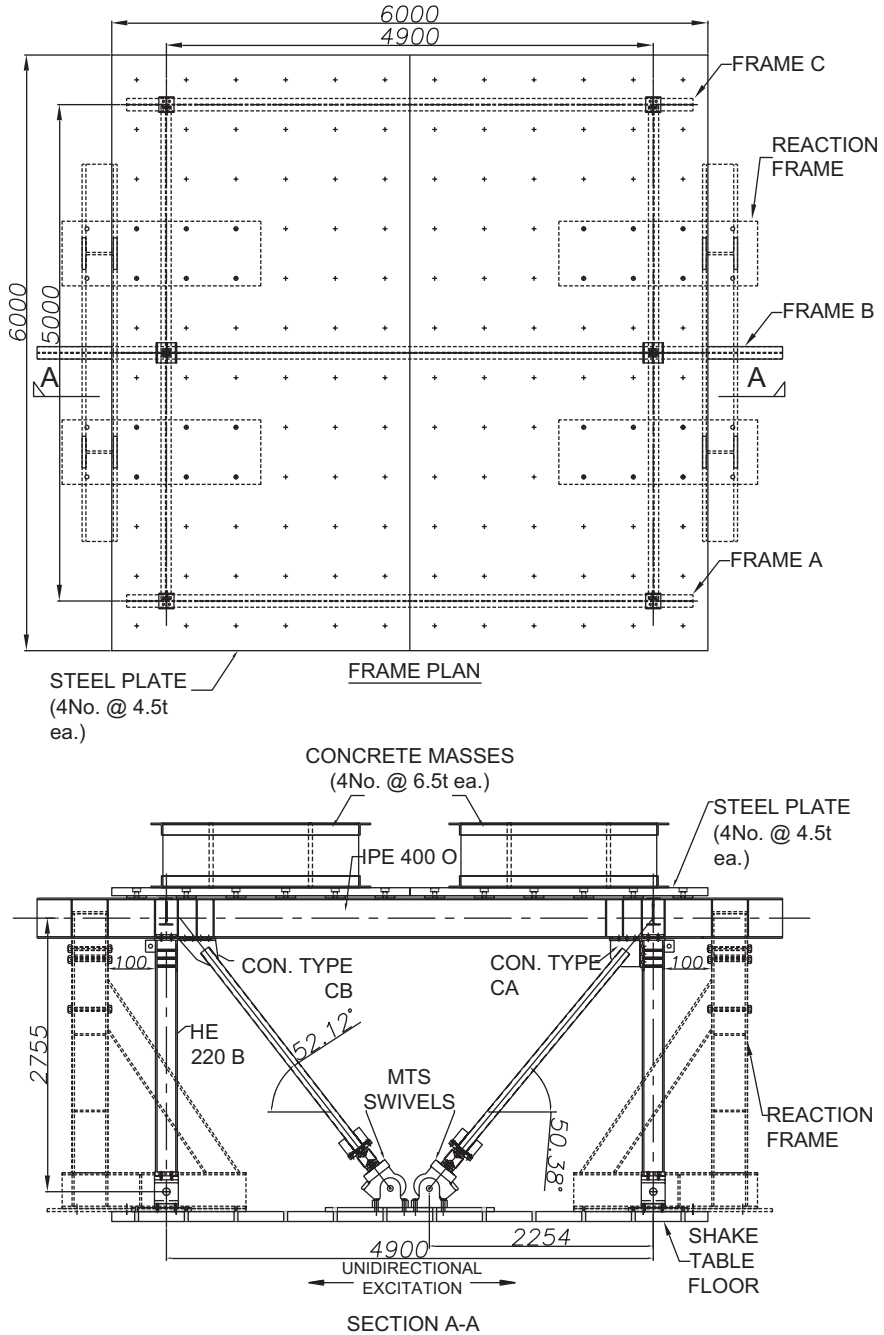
Plan and elevation of BRACED test frame on Azalee platform. CA and CB connections shown for illustration, identical brace specimen pairs were used in all tests
